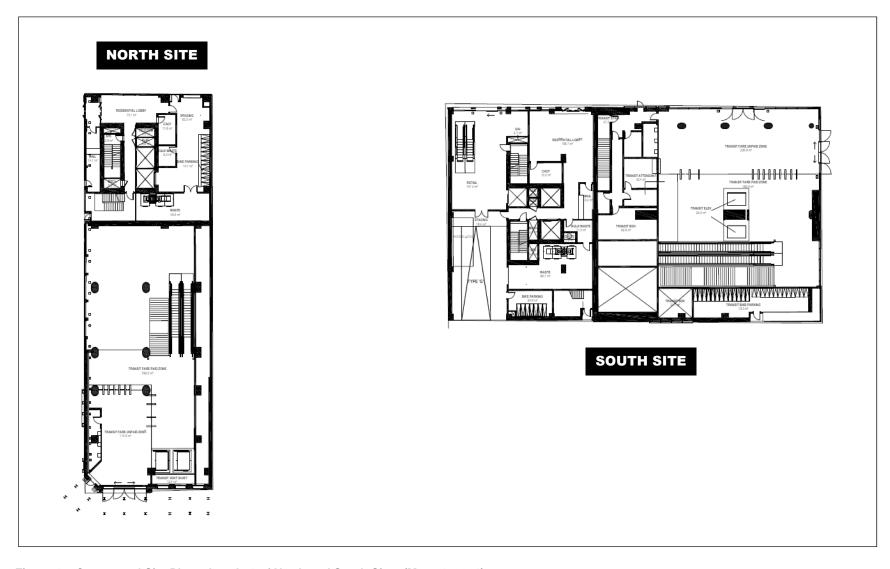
Conceptual Site Plan - Level 01 of North and South Sites (May 21, 2021)
